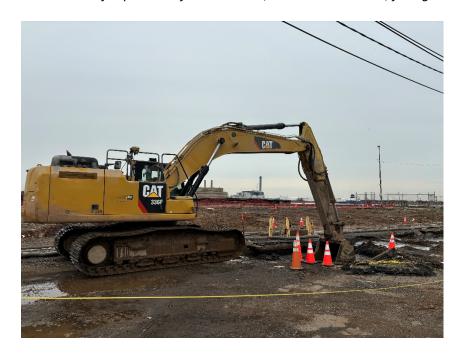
View of expansion of Excavation 4, IRM 1 Eastern Area, northwest west.
